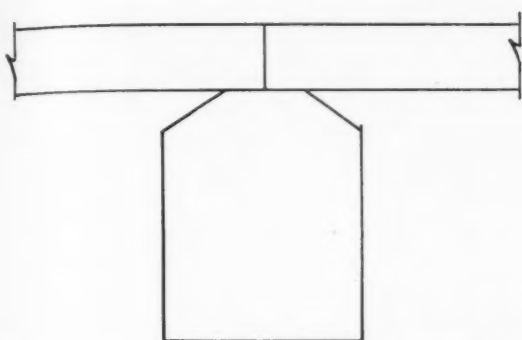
Section through roof plank and beam showing a method for retarding rotting over beams.
